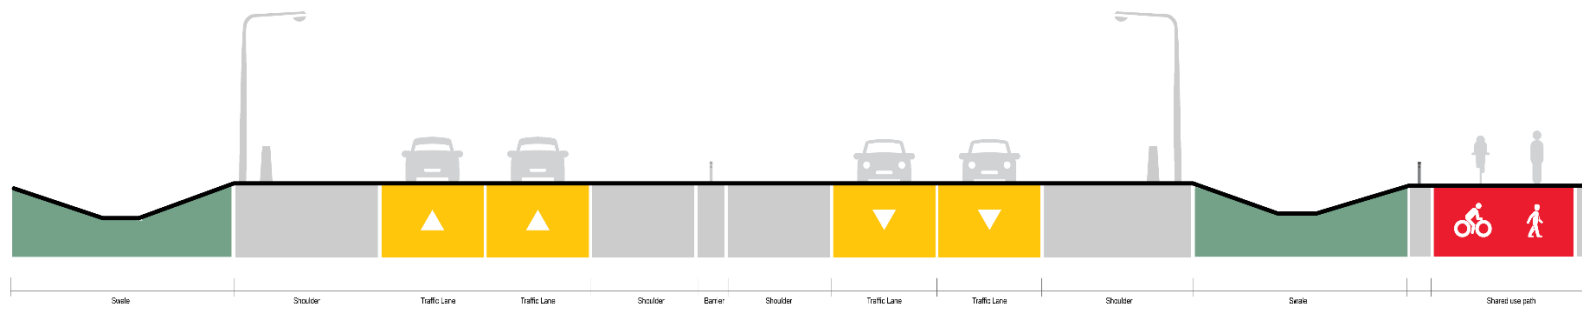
Indicative Alternative State Highway cross sections – West of North Auckland Line
